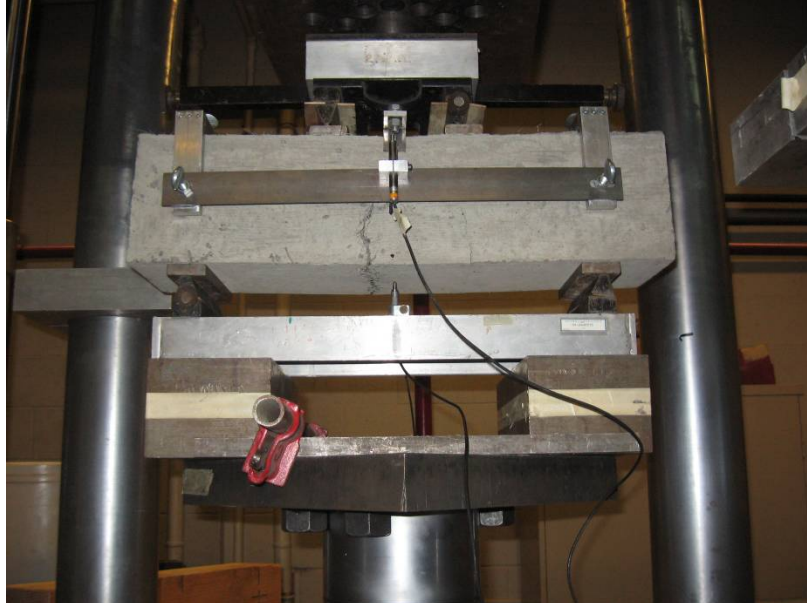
Flexural failure in FRC beam tested according to ASTM C1609
